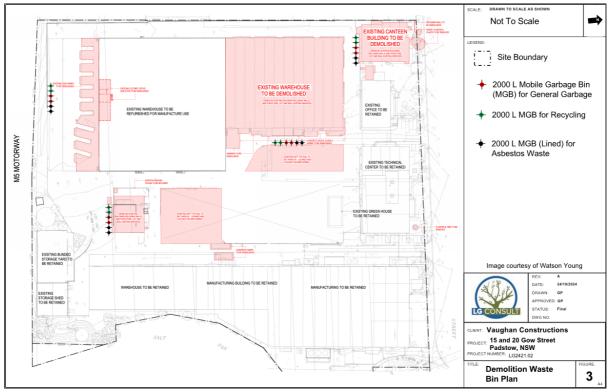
Demolition Waste Bin Plan (Source: LG Consult, 2024)
